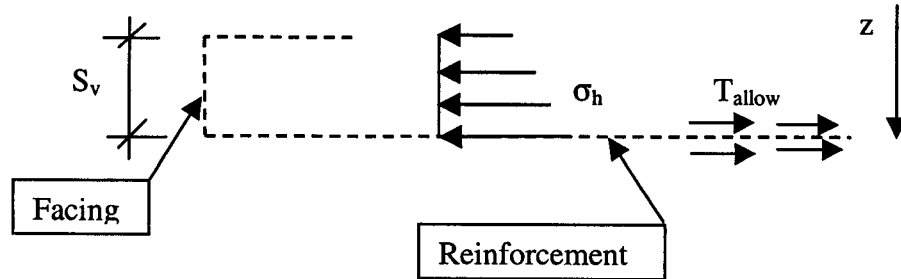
Schematic section view of the reinforcement in the RE wall
